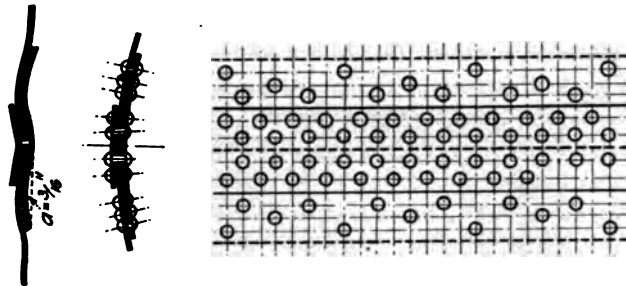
BENDING OF BUTT JOINT TESTED TO DESTRUCTION
